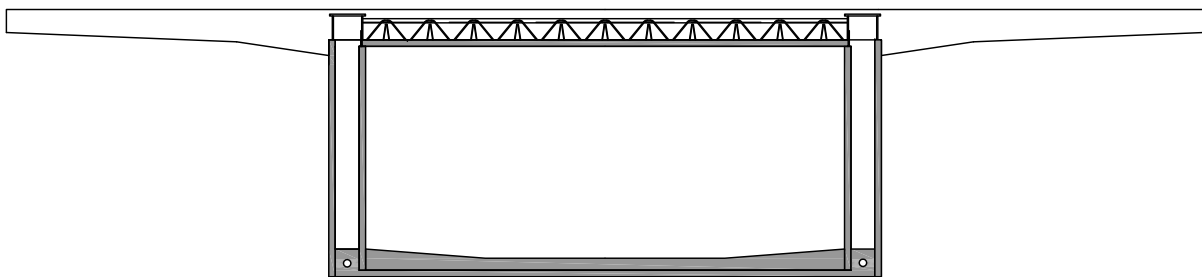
Cross-section of the developed bridge girder using double wall elements and thin-walled precast elements for large multi span bridges with the lightweight box-cross-section shown in dark gray
